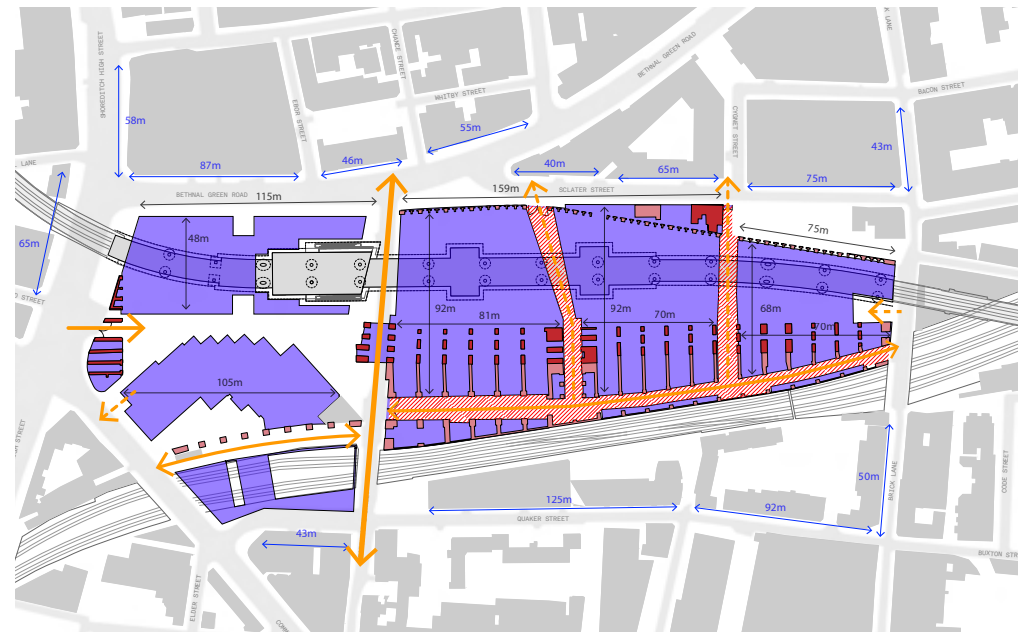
2015 Scheme: Ground Block Plan
